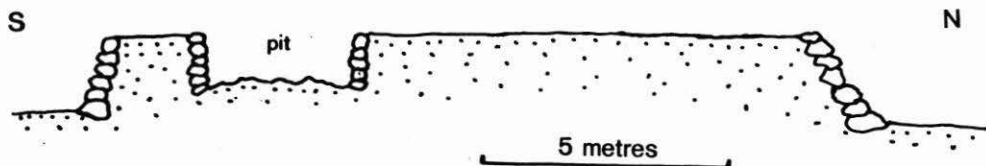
North-south cross-section of platform on N41/135, showing defensive retaining walls and stone-faced pit.
